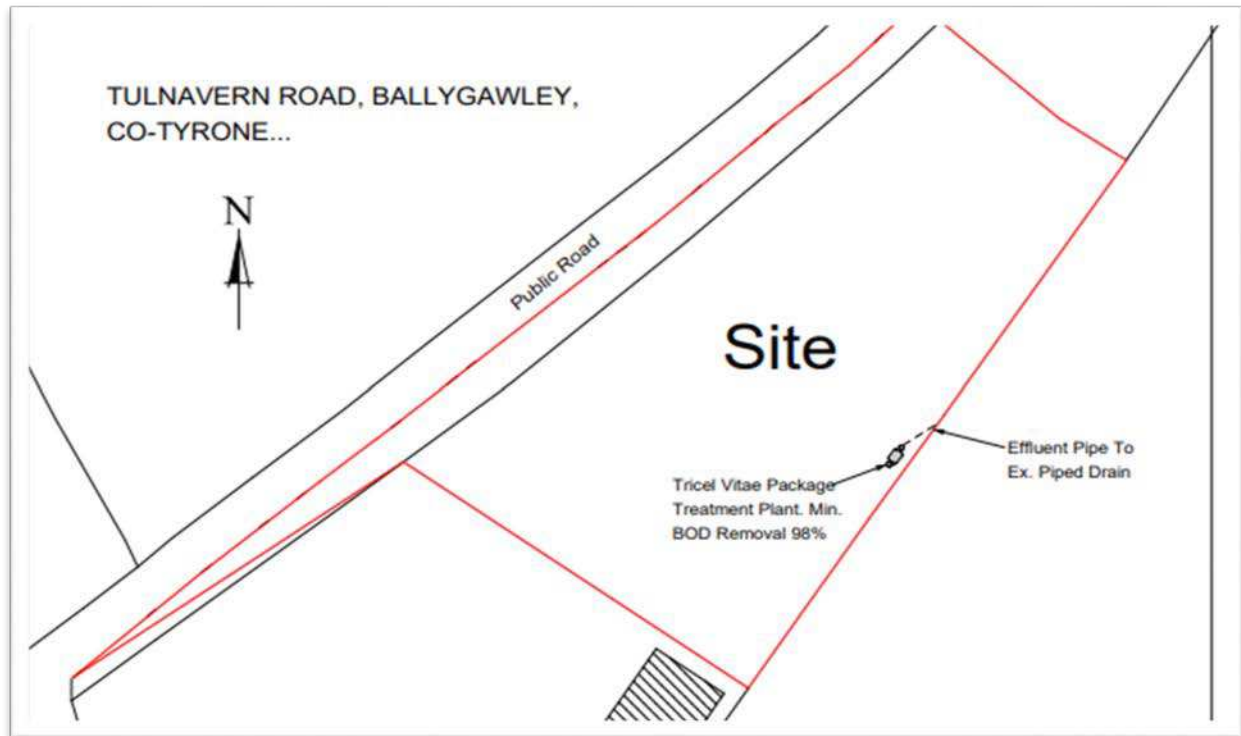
Indicative Sewerage Layout Plan as provided by agent
